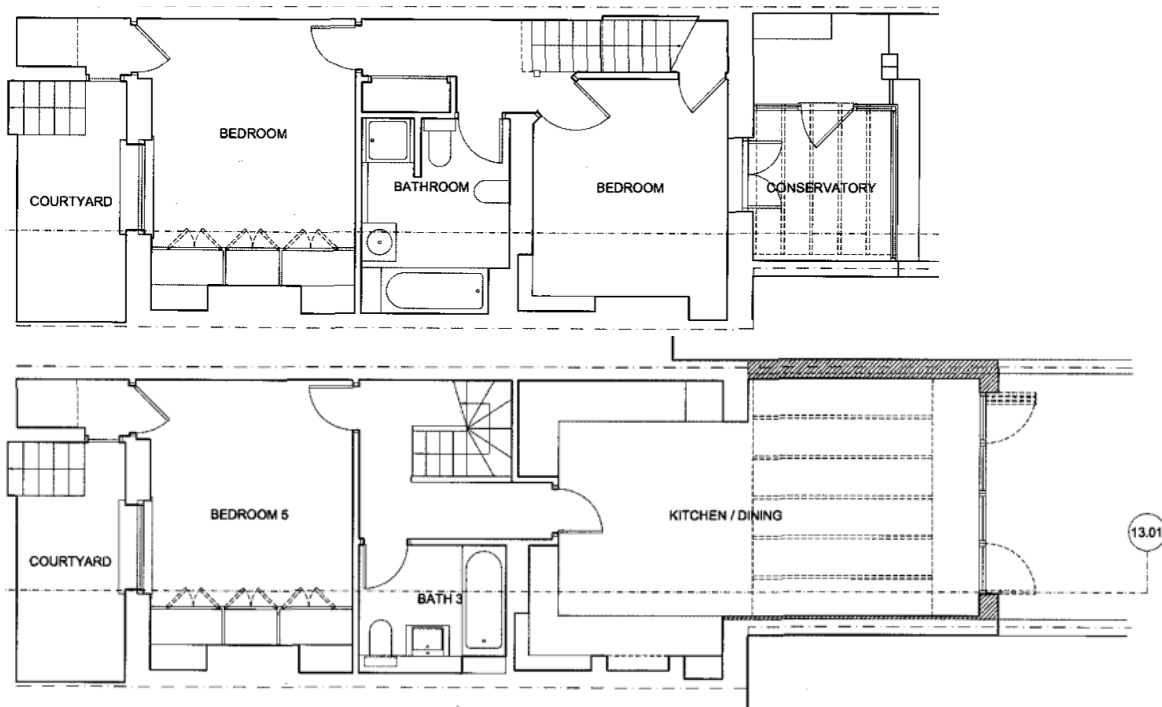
Pre 2010 layout at lower ground floor (top) and consented plan (bottom) from 2010 application.
